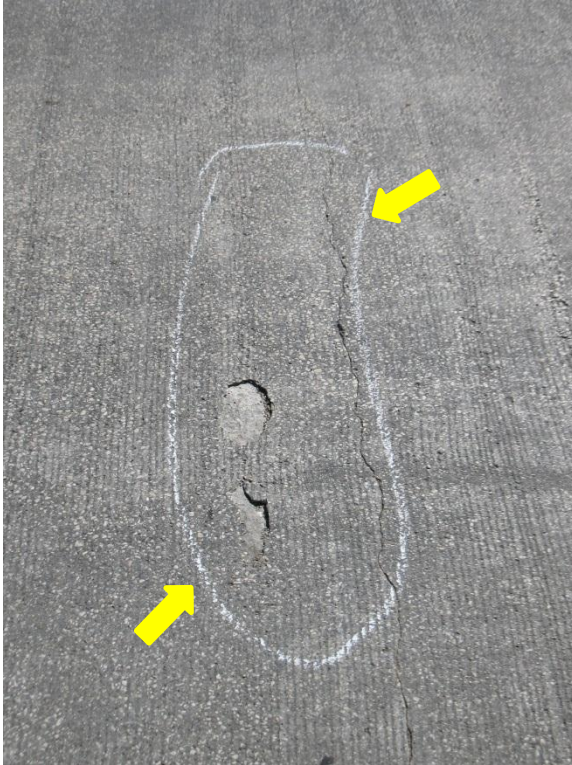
Delamination (highlighted with chalk) of concrete on one side of crack.
